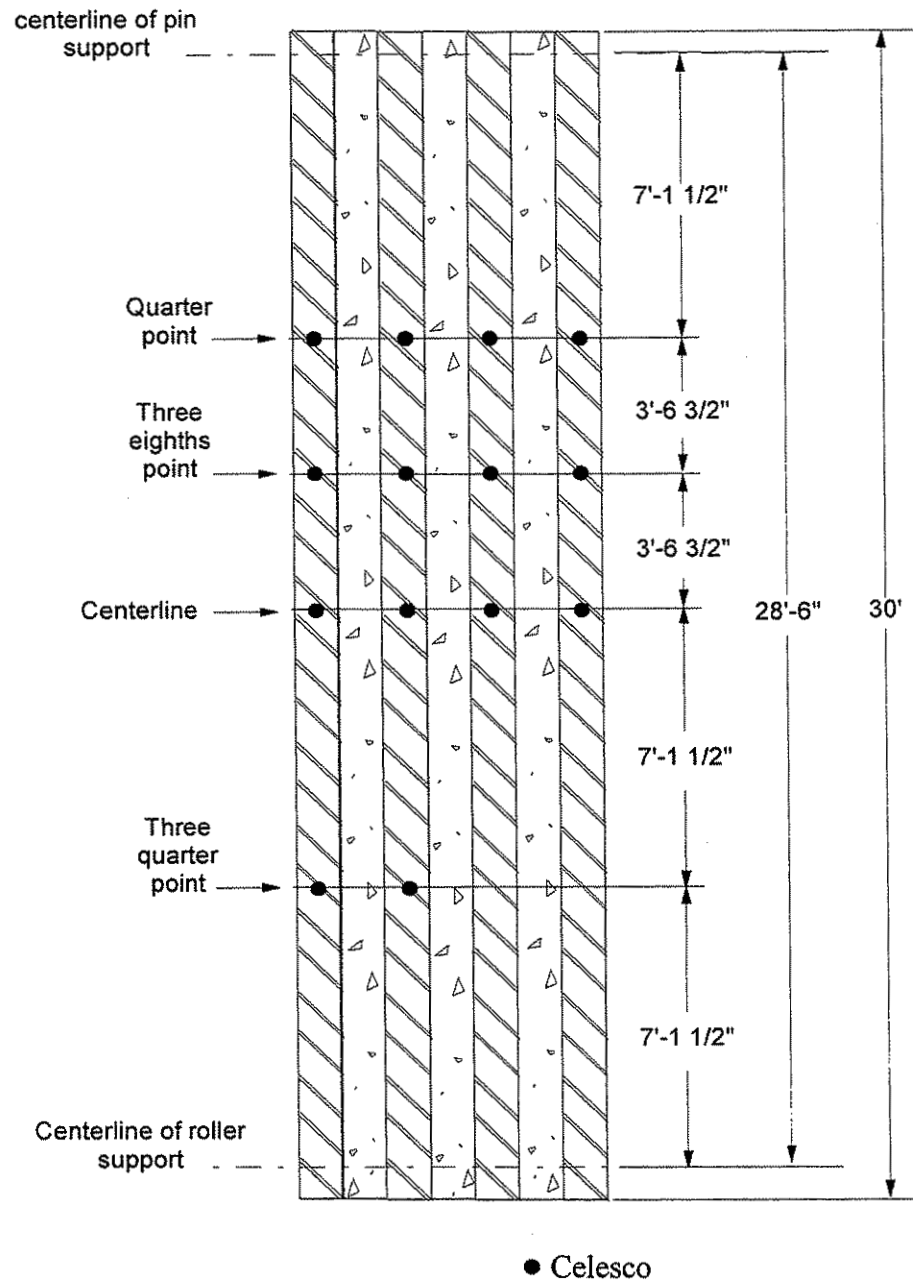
Location of strain gaged cross sections on four-beam specimen.
